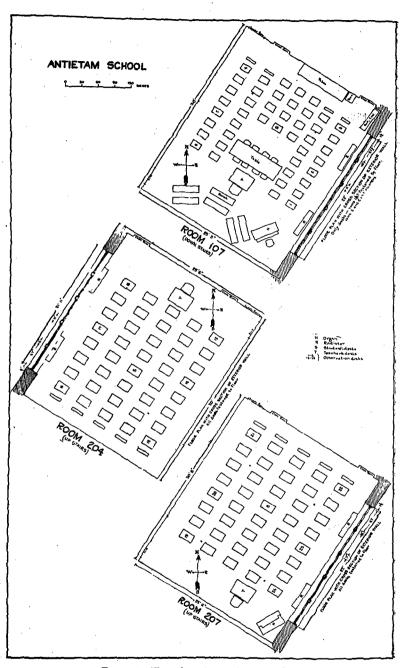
Floor plans of rooms 107, 204, and 207
